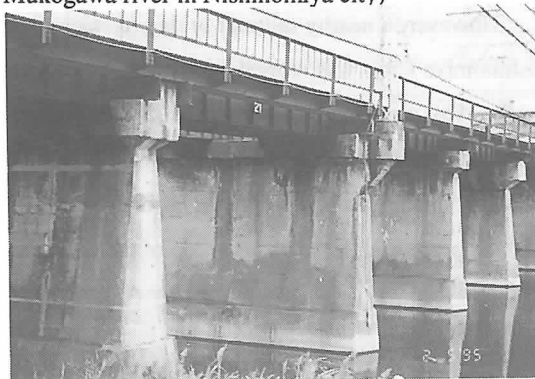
Undestroyed RC pier (railway bridge, steel girder, constructed in 1926, Mukogawa river in Nishinomiya city)
